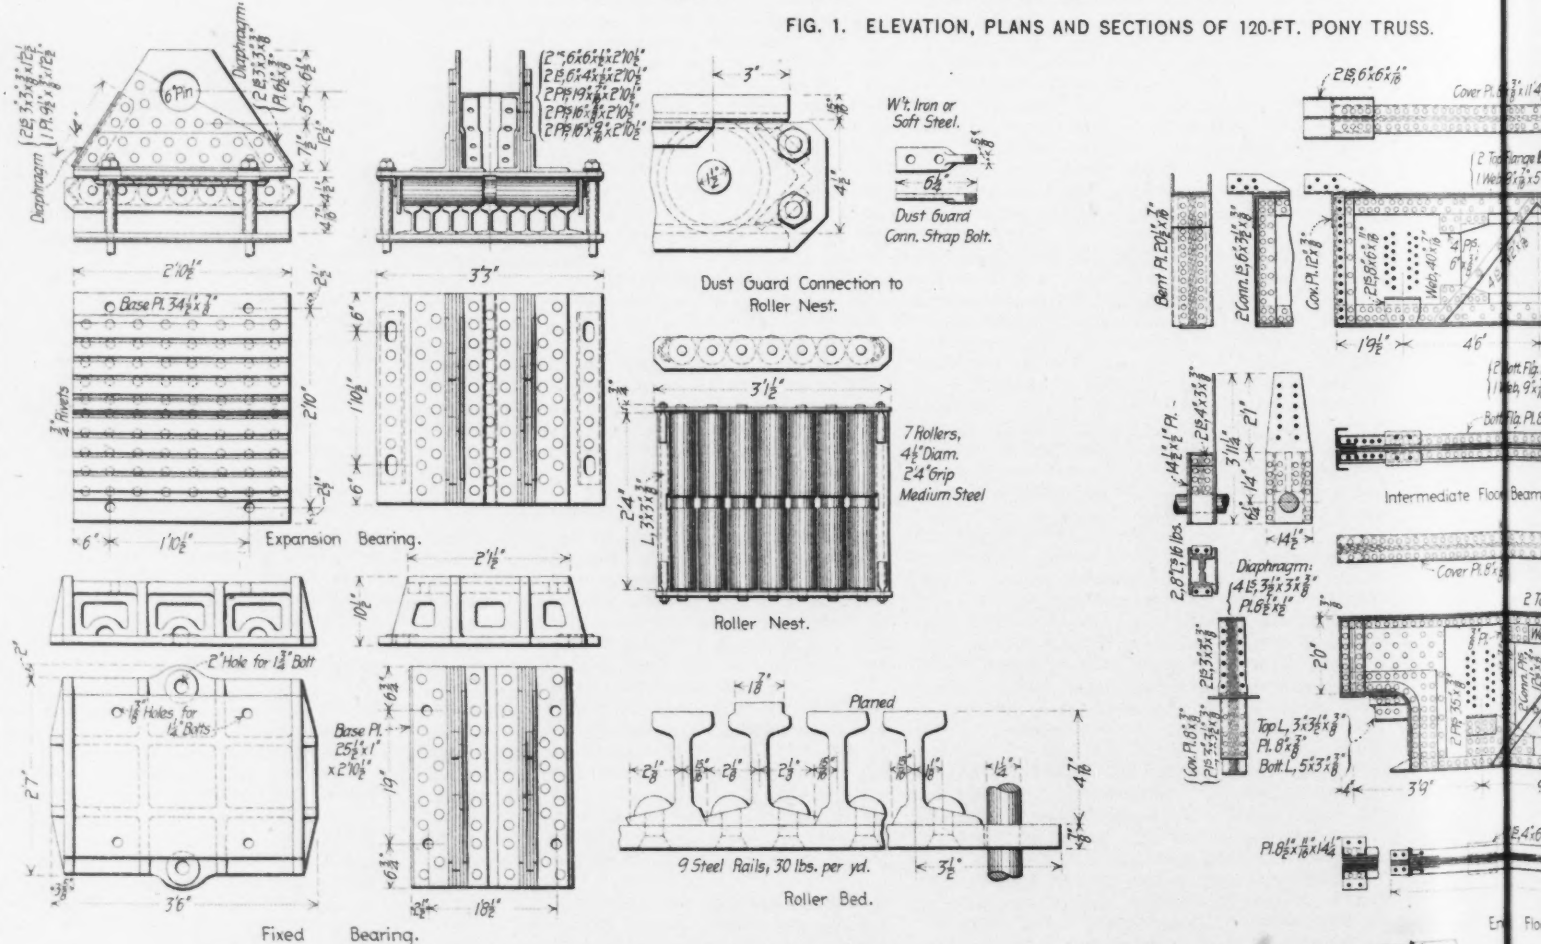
DETAILS OF FIXED AND EXPANSION BEARINGS FOR PONY TRUSS.
